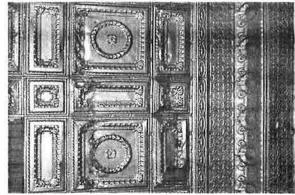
In 1911, the District Courtroom was outfitted with a decorative pressed metal ceiling. While the ceiling is existing, it has apparently begun to rust from the backside. Ragged holes have formed in metal that appears to be in pristine condition, suggesting water infiltration causing rust from the top side of the metal panels.
